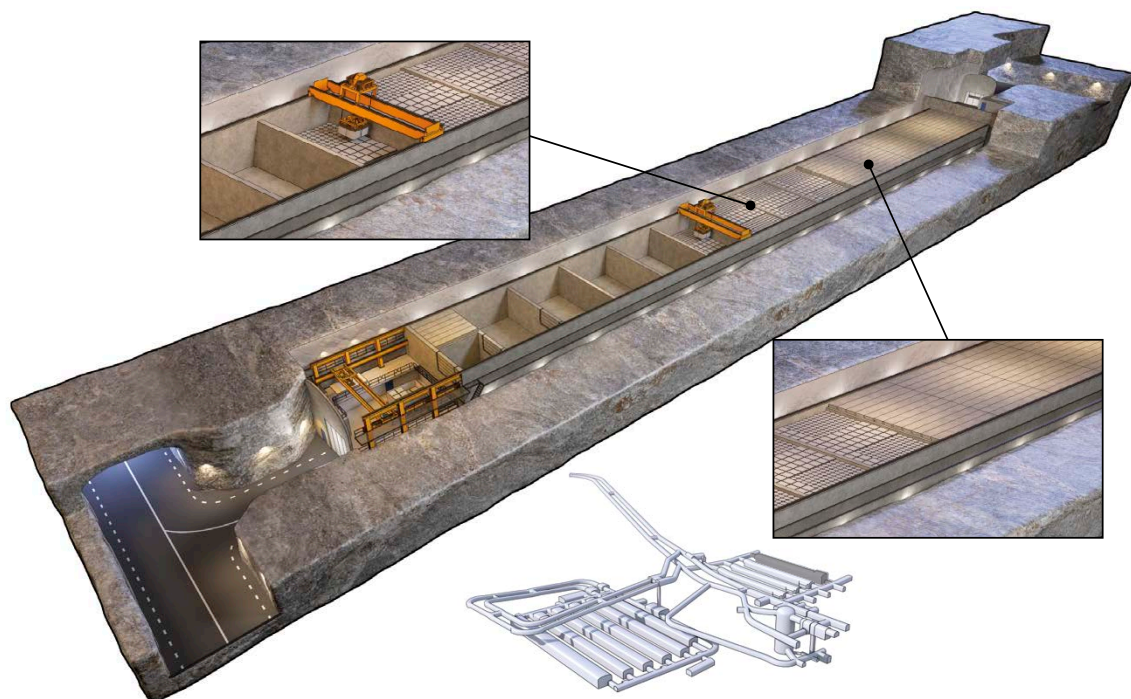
Illustration of 1BMA during the operational period. The upper detail shows the emplacement of waste packages, the lower detail shows the concrete lid. In addition, there is a view of SFR with the position of 1BMA in darker grey.
